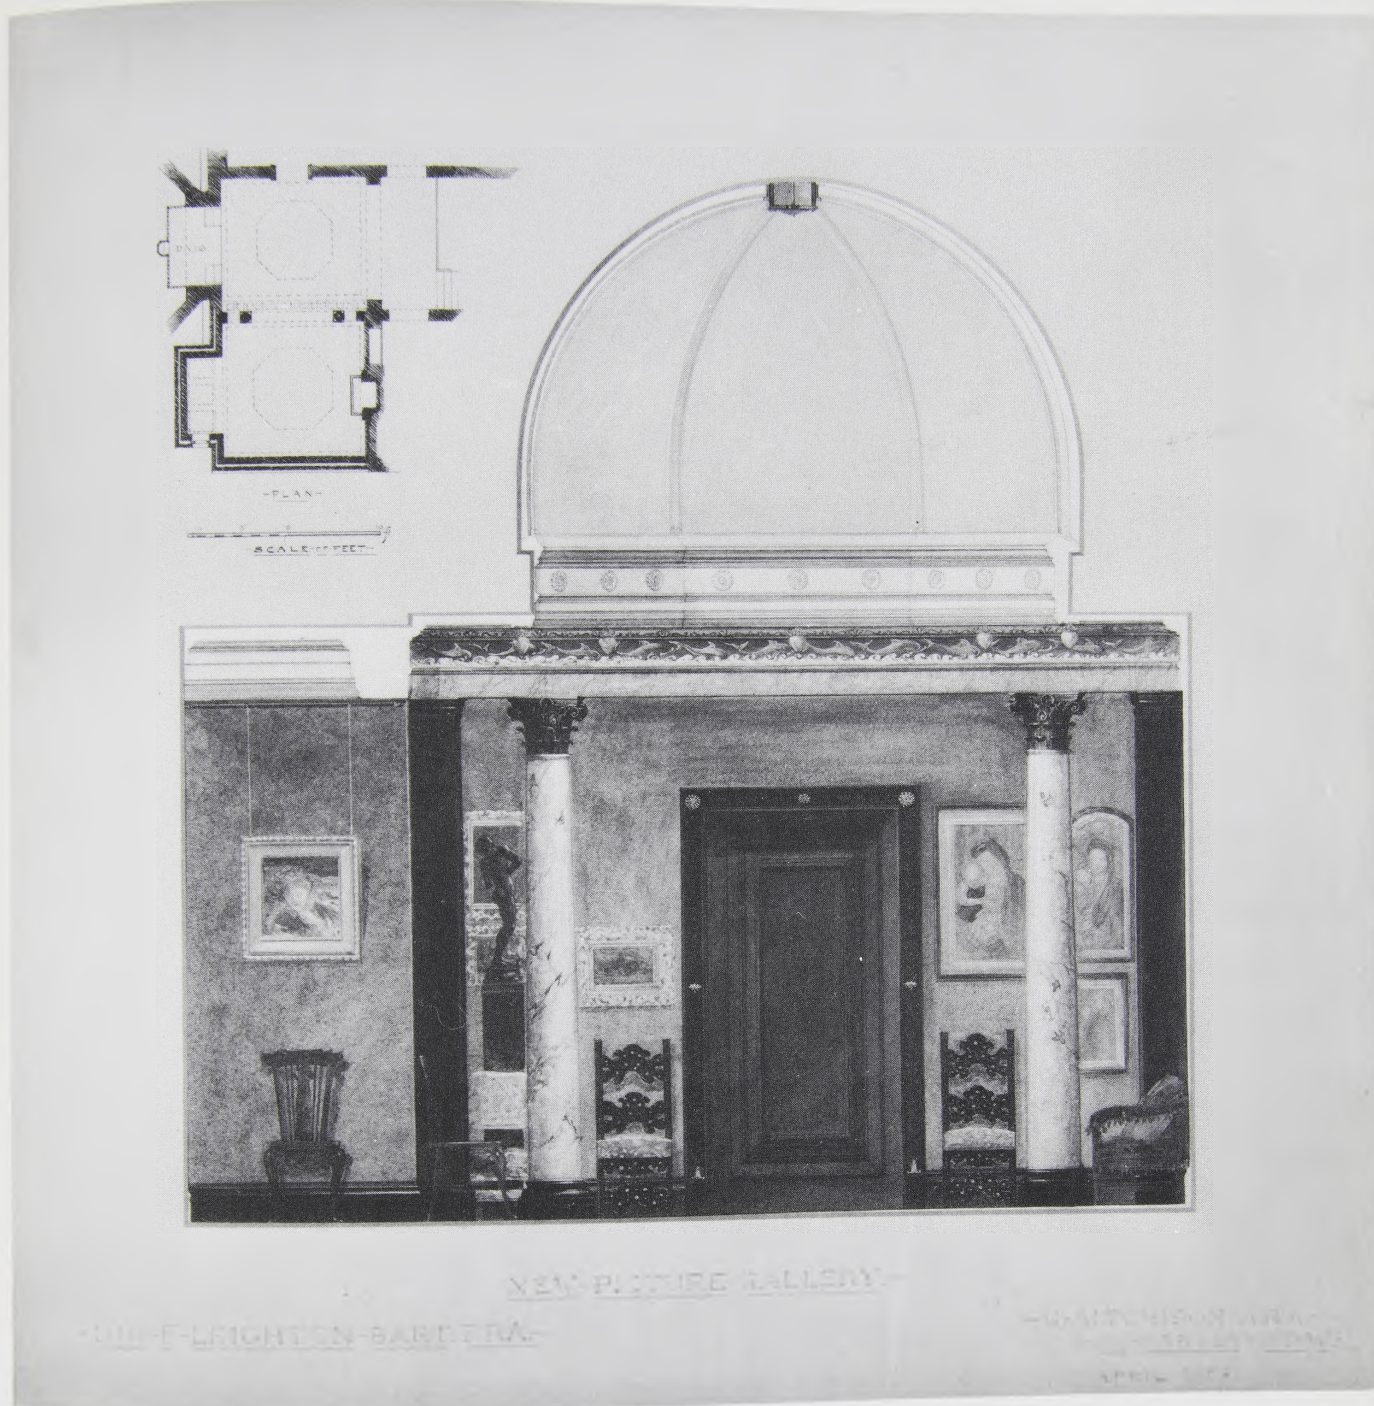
George Aitchison. London, Holland Park Road, Leighton House: Design for the elevation of a wall of the picture gallery
